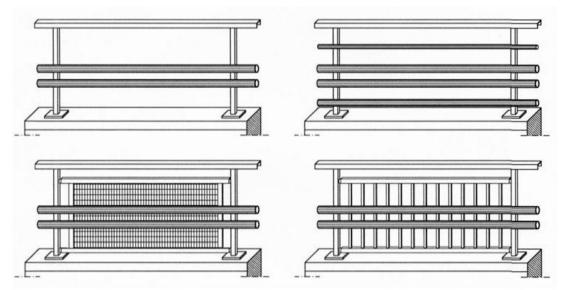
Basic examples of steel bridge railings with different equipment: sparse railing [top left], dense railing [top right], mesh railing [bottom left], and slatted railing [bottom right] (Liikenneviraston ohjeita 25/2012)
